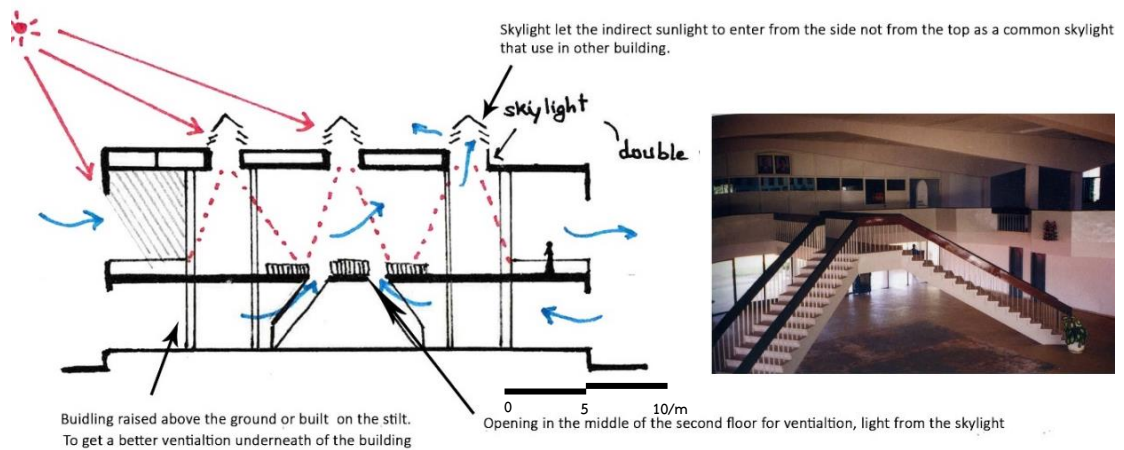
5 Section diagram of the building showing, raised ground level to facilitate ventilation and allow a multipurpose space beneath the building. (source: New Khmer Architecture Book)
